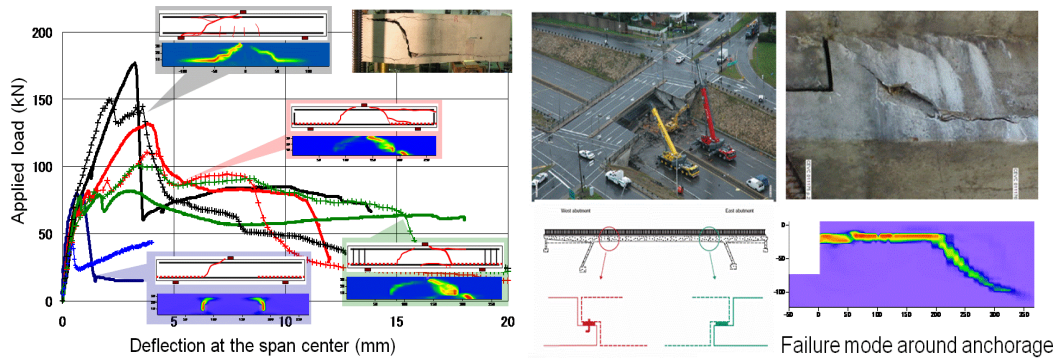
Macro-Scale Cracking around Anchorage Zones and Mode of Collapse [Chijiwa 2008].
